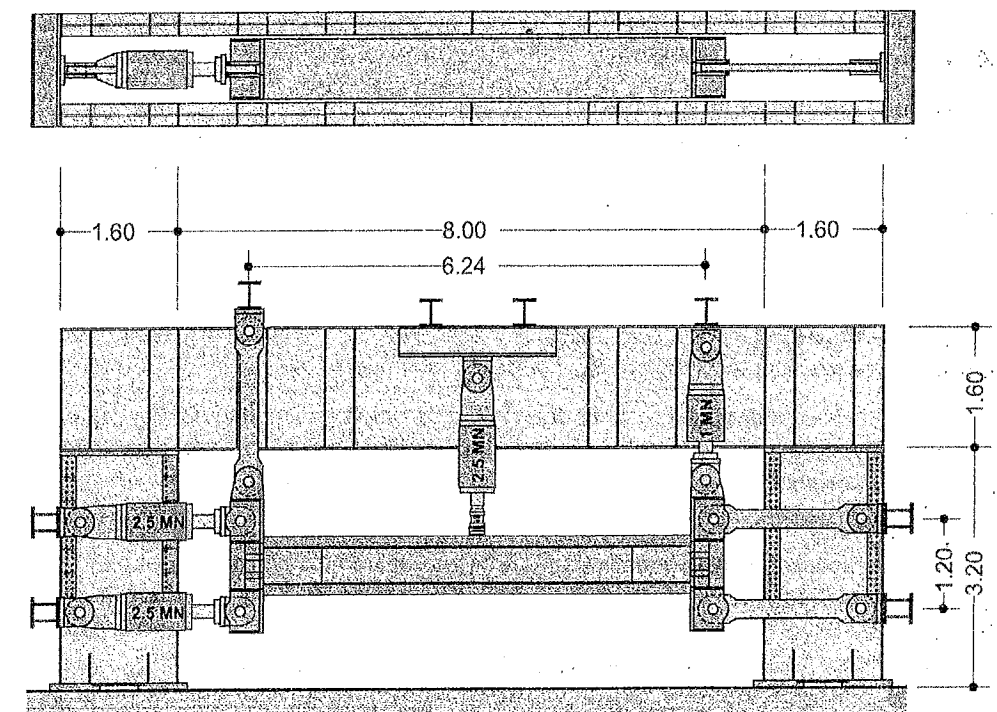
Beam Element Tester (BET), plan and elevation (jack at midspan used for test series MVN only; dimensions [m]).
